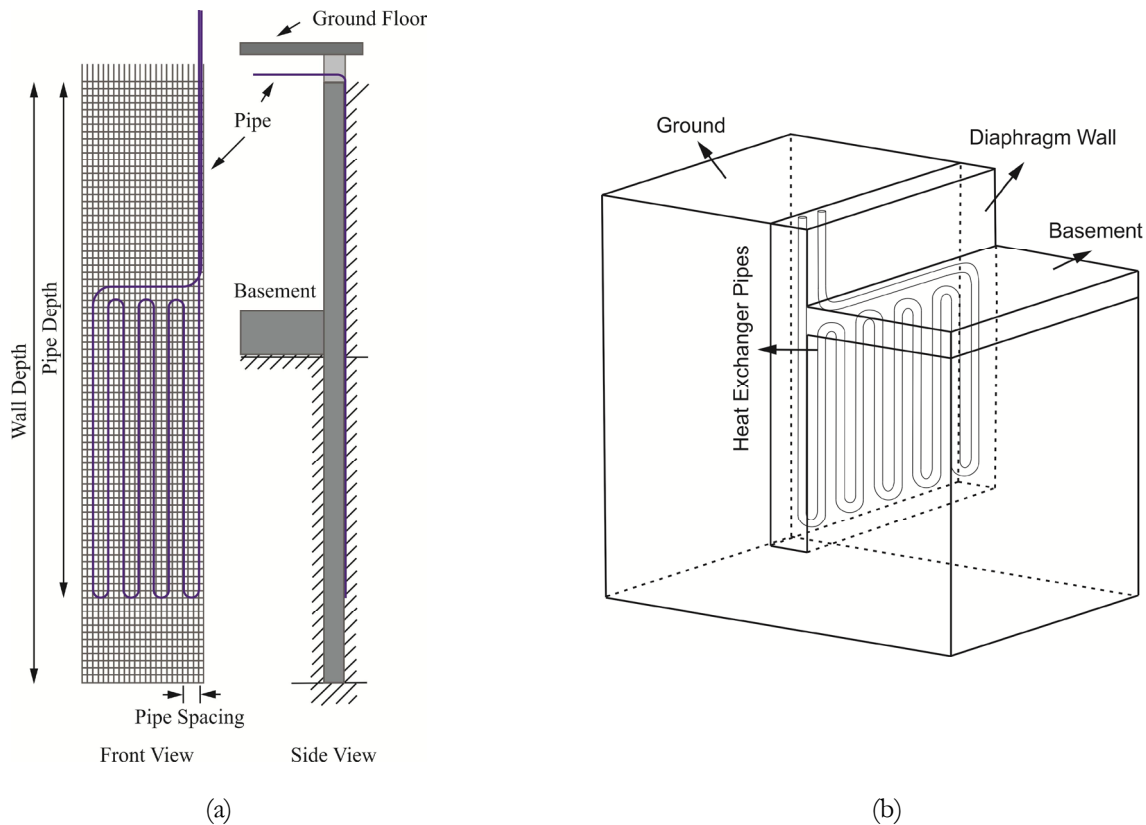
Schematic representation of a diaphragm wall heat exchanger and its surrounding boundaries.
